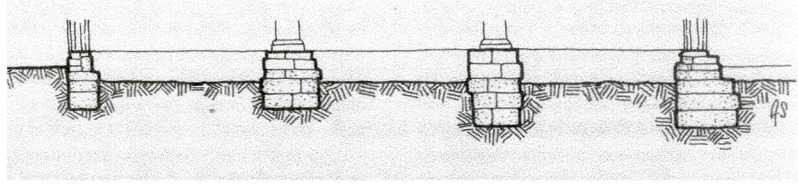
Delos, third century BC, section showing single column type (source: Mark, 1993)
